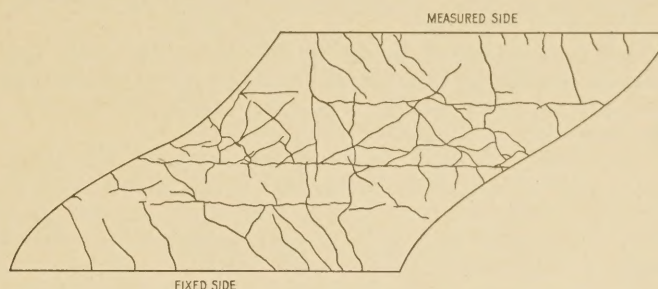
The intrados of the 60° skew arch showing the cracks which developed under final load of 60,000 pounds
